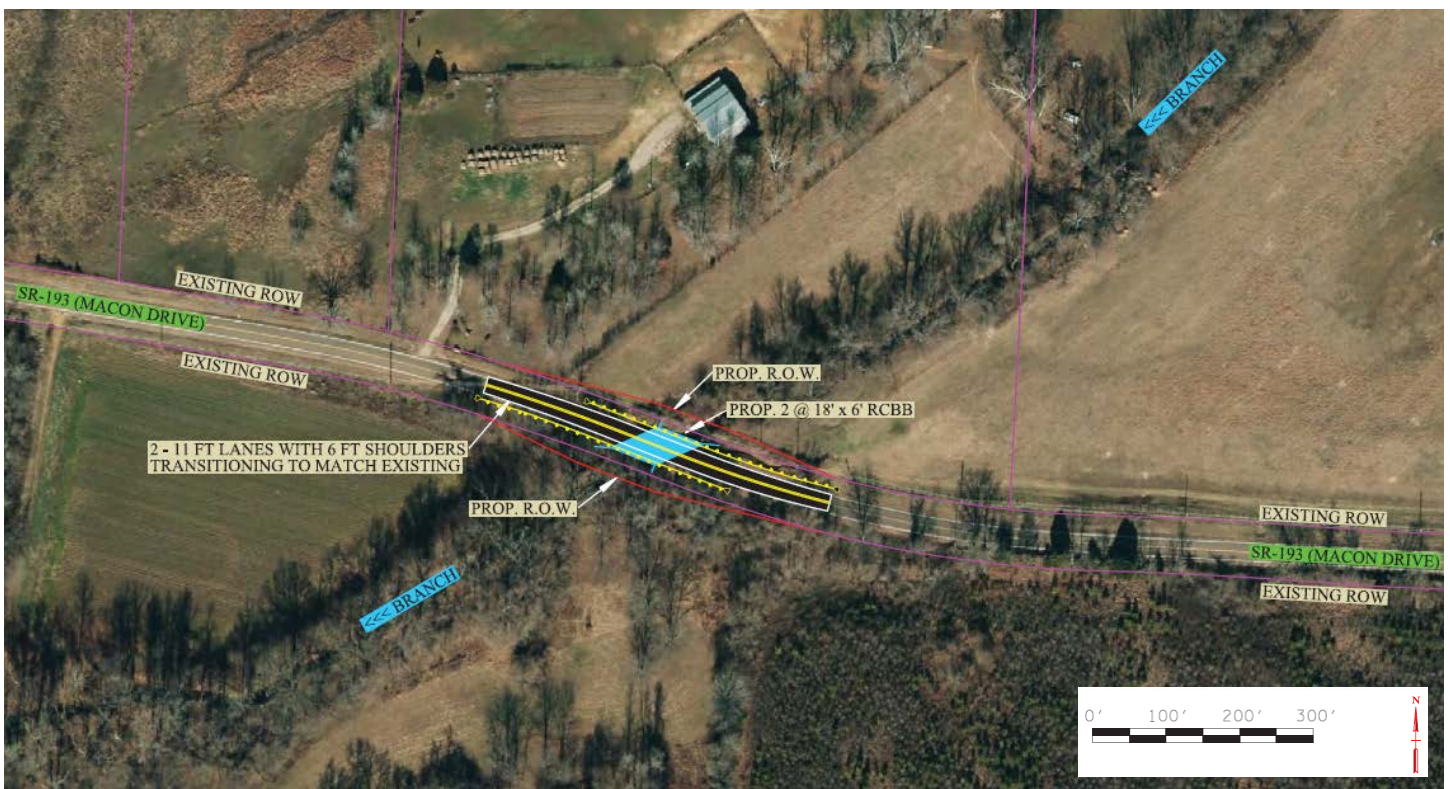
Functional layout for proposed bridge replacement, aerial view. Proposed ROW lines are for planning purposes.
